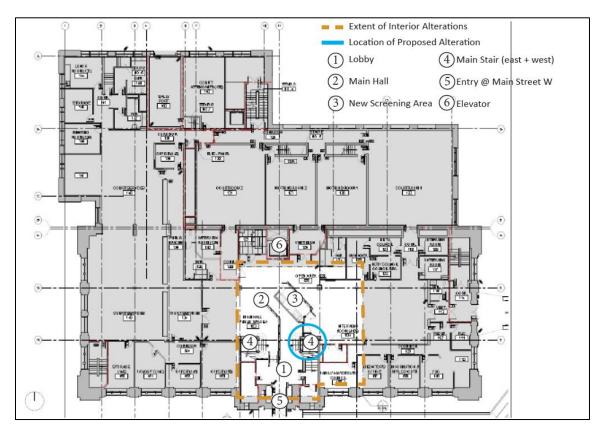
Main Floor Plan showing the location of the proposed alterations to the interior west marble stairs.
